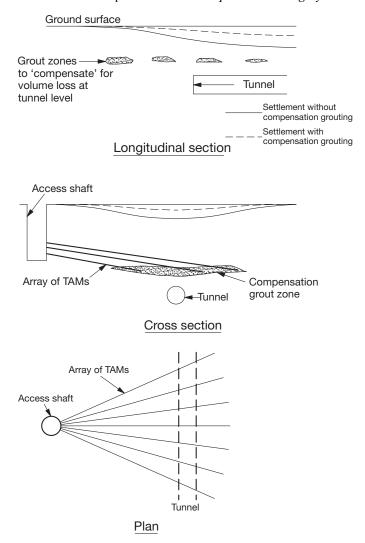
Compensation grouting for tunnel construction (after Woodward 2005 and Burland et al. 2001a)
